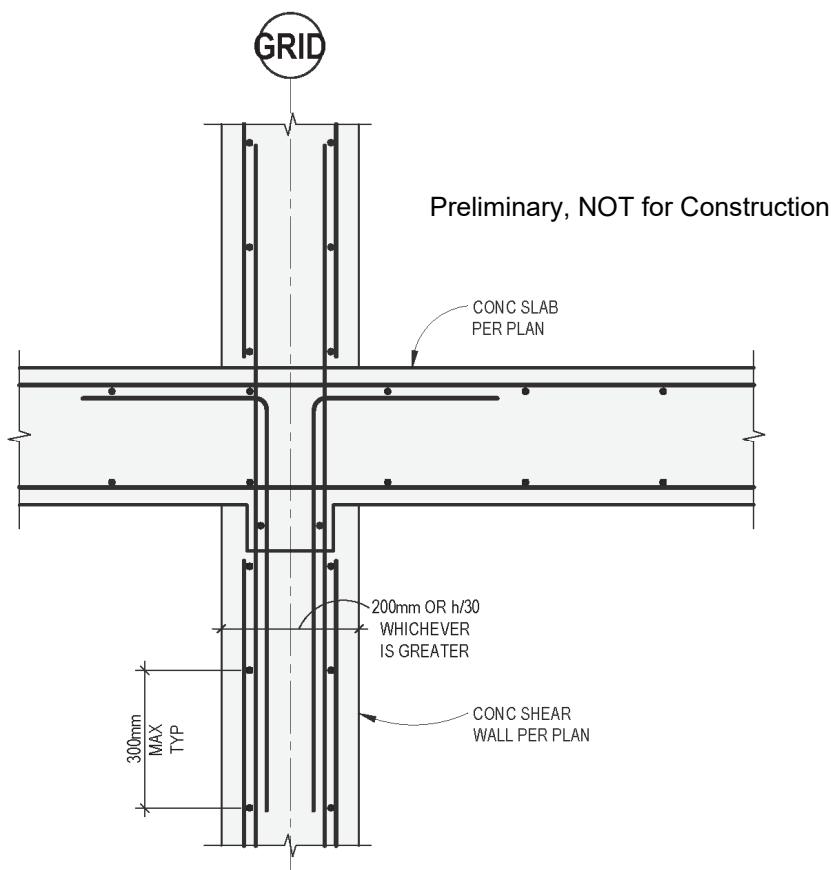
Conceptual detail of reinforced concrete shear walls at intermediate floor or roof slabs (courtesy of MHP Structural Engineers).
